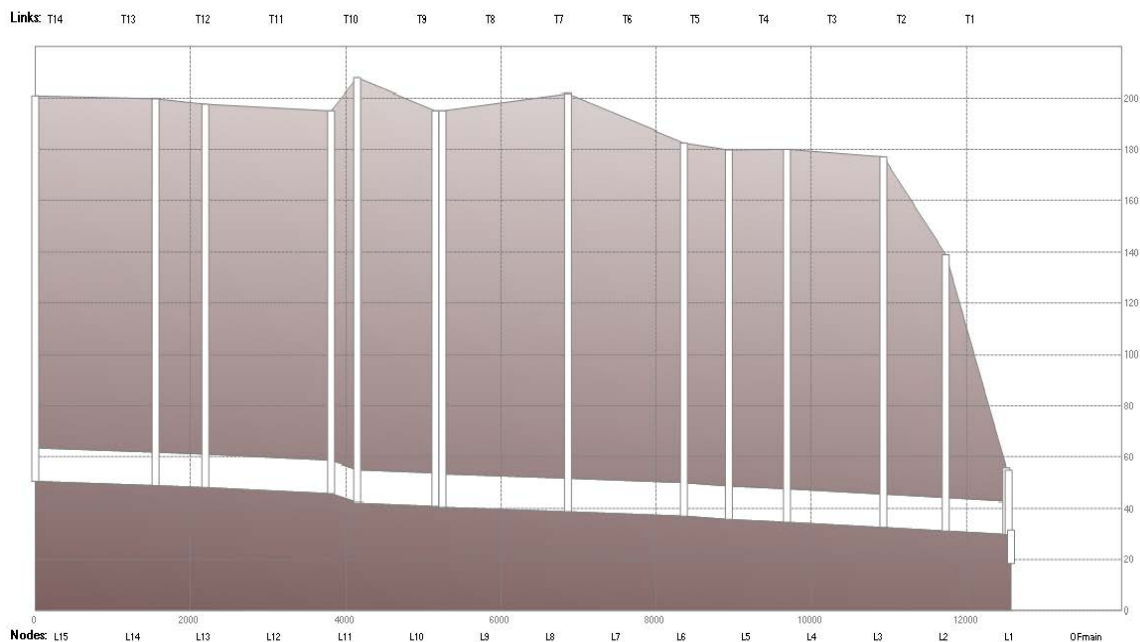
The main deep drainage tunnel profile of St. Anthony Park watershed as drawn by PCSWMM, with manhole numbers (Nodes; bottom) and conduits between manholes (Links, above). The elevation scale (feet above sea level) is on the right side.
